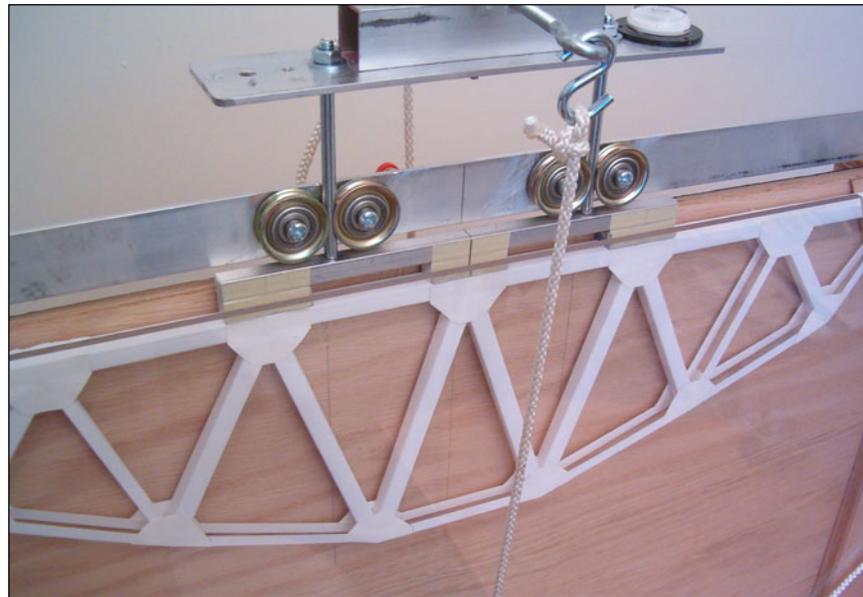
Load was transferred to truss through bar stock at joints C, D, and E.
